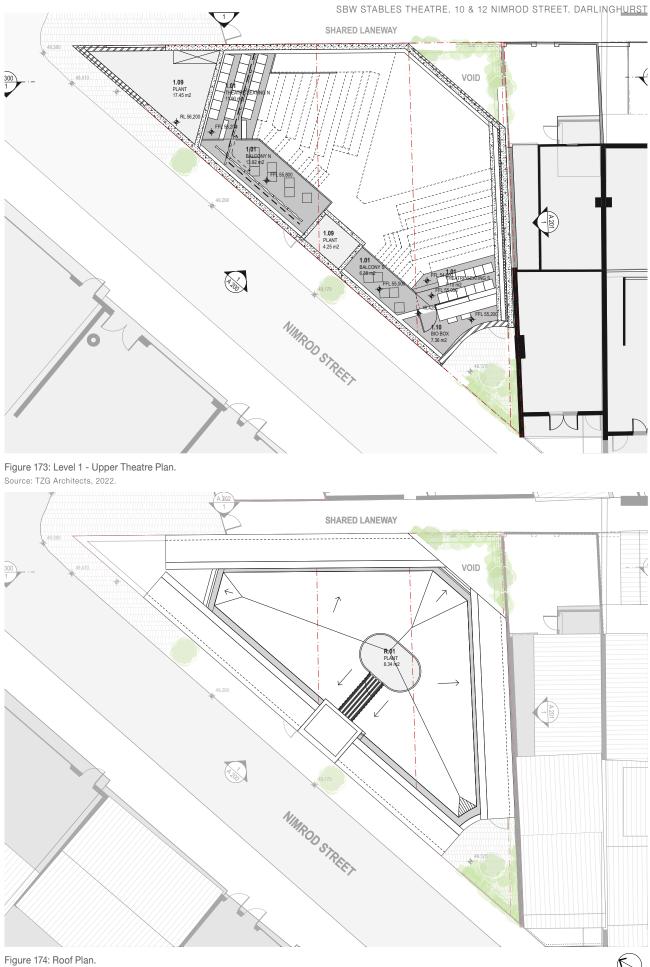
/4: Roof Plan. Source: TZG Architects, 2022.
